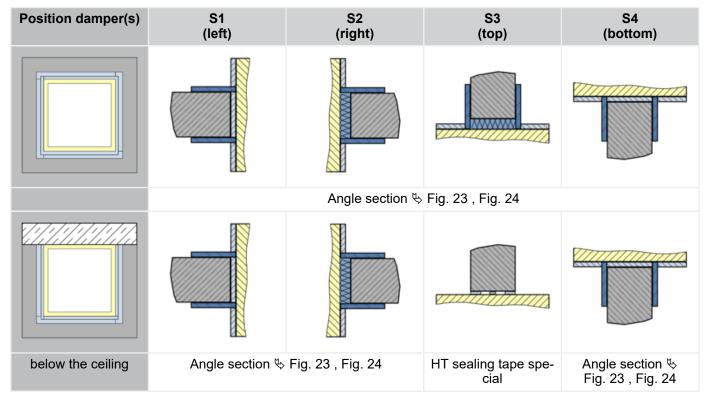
Installation example EK-JZ Dry mortarless installation in solid wall, solid shaft wall EI 120 S
